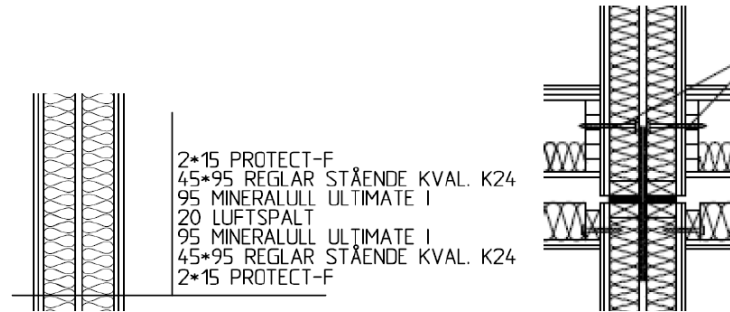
Drawings of the separating walls, i.e. inner walls (left) and the assemblage with the floor/ceiling (right).
